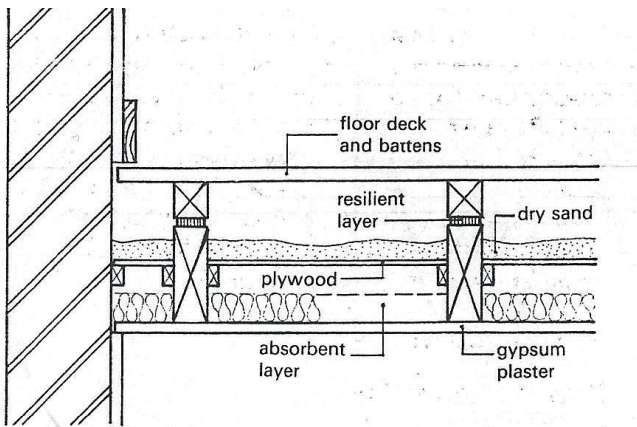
Typical construction used in timber floors to limit air-borne and structure-borne sound transmission.
